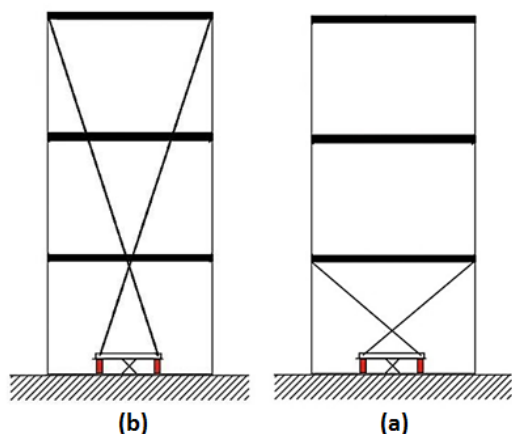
Schematic of the three-story shear frame with the connection of brace-swing-damper system cables to a) the first floor (case 1) and b) the last floor (case 2).
